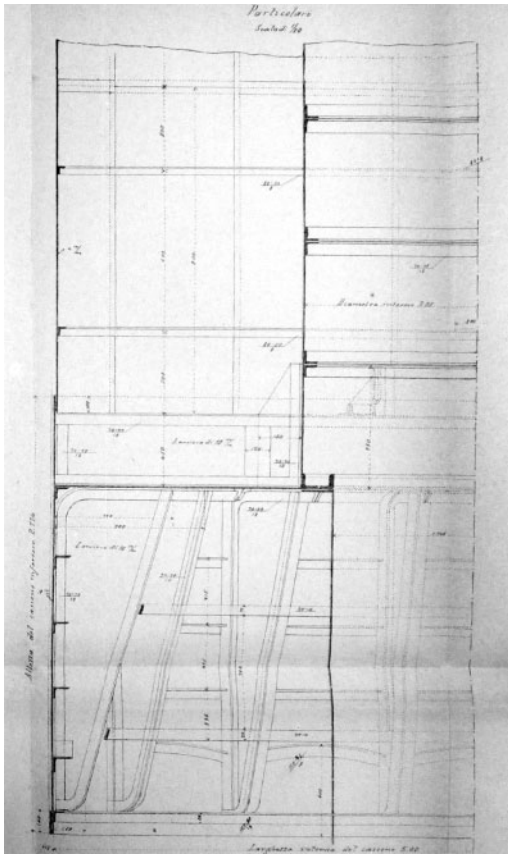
Piacenza Bridge: the construction details of the wrought iron caisson (Biadego 1886).
